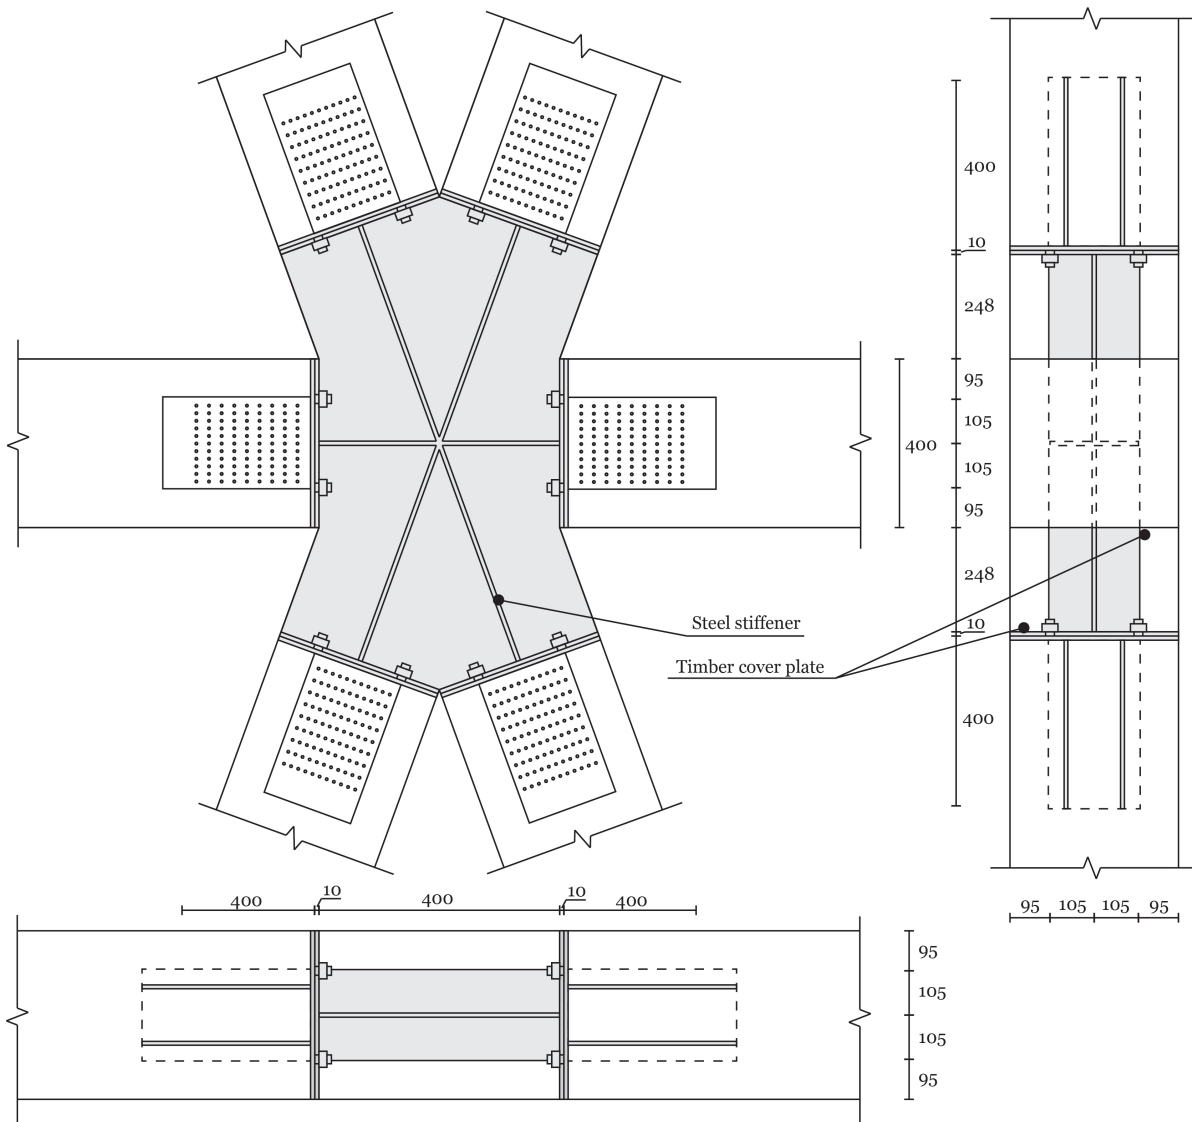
Detail of connection between diagonals using slotted-in steel plates and dowels
